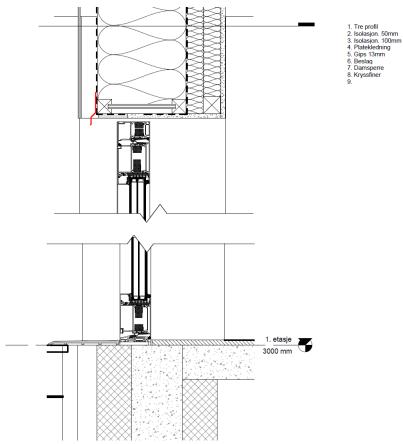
Details of the exterior door. Illustration: ABO Plan og Arkitektur.
